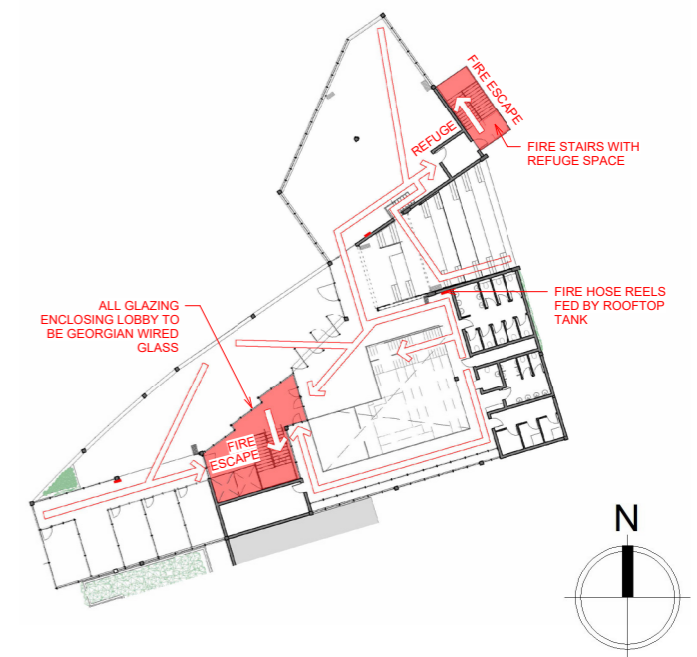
| First Floor Fire Plan NTS (Author 2022)
